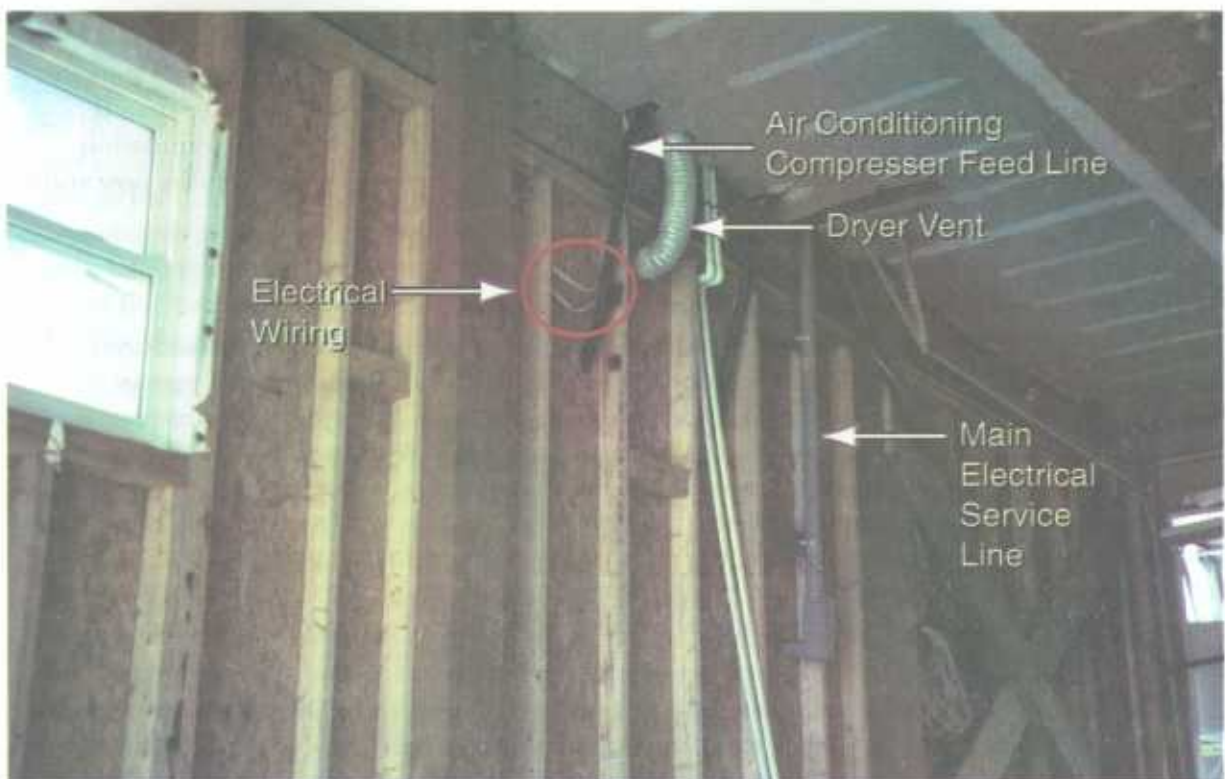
Utility components (dryer vent, air conditioning compressor feed line, main electrical service line out of meter box, and electric wiring) penetrating breakaway wall panel.
